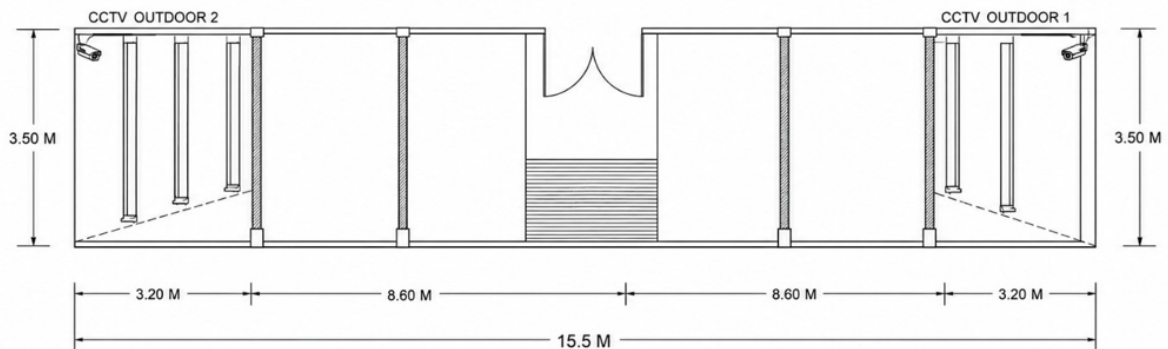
Front elevation view of CCTV outdoor camera placement at the mosque parking area
